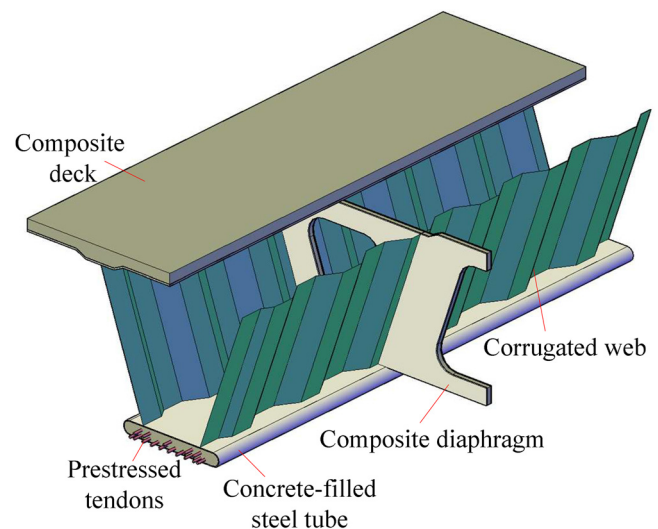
Prefabricated composite box girder with corrugated webs and steel tube slab.
